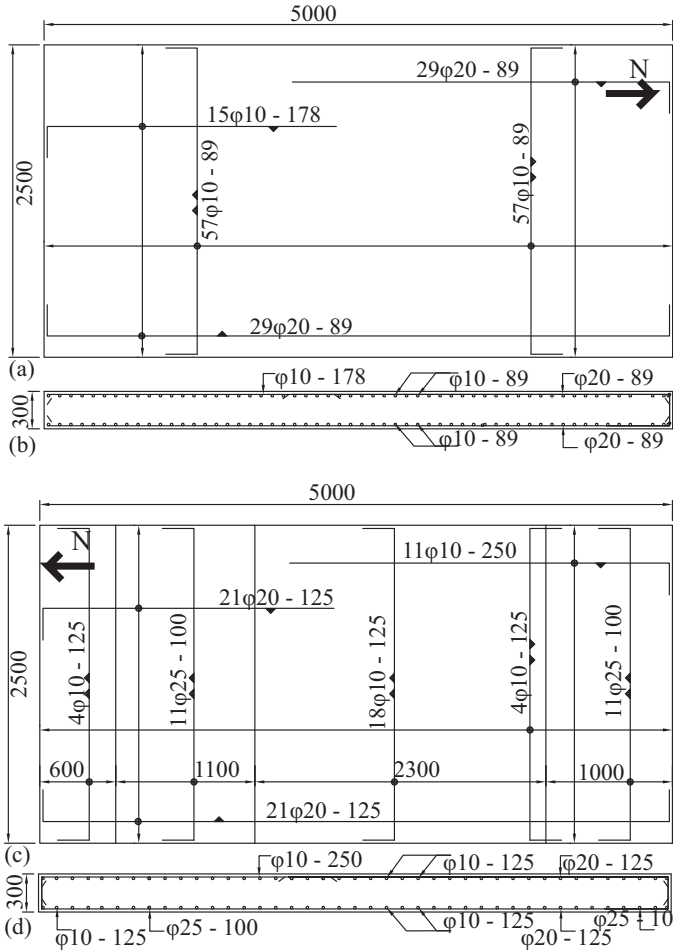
Reinforcement layout for slabs with plain reinforcement or supported by elastomeric bearings: (a) top view of S11-S14; (b) cross section of S11-S14; (c) top view of S15-S18; (d) cross section of S15-S18 in [mm]
